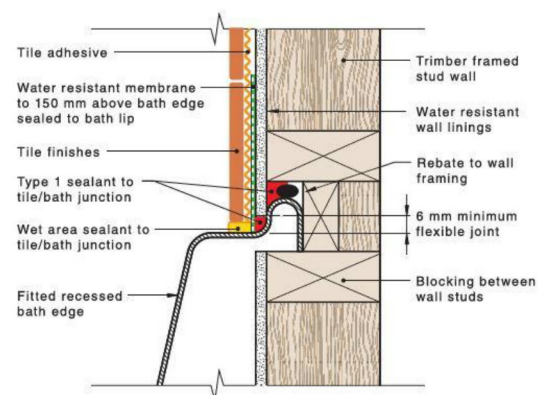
(D) — Bath with no shower over it — Fitted bath — Timber-framed wall
